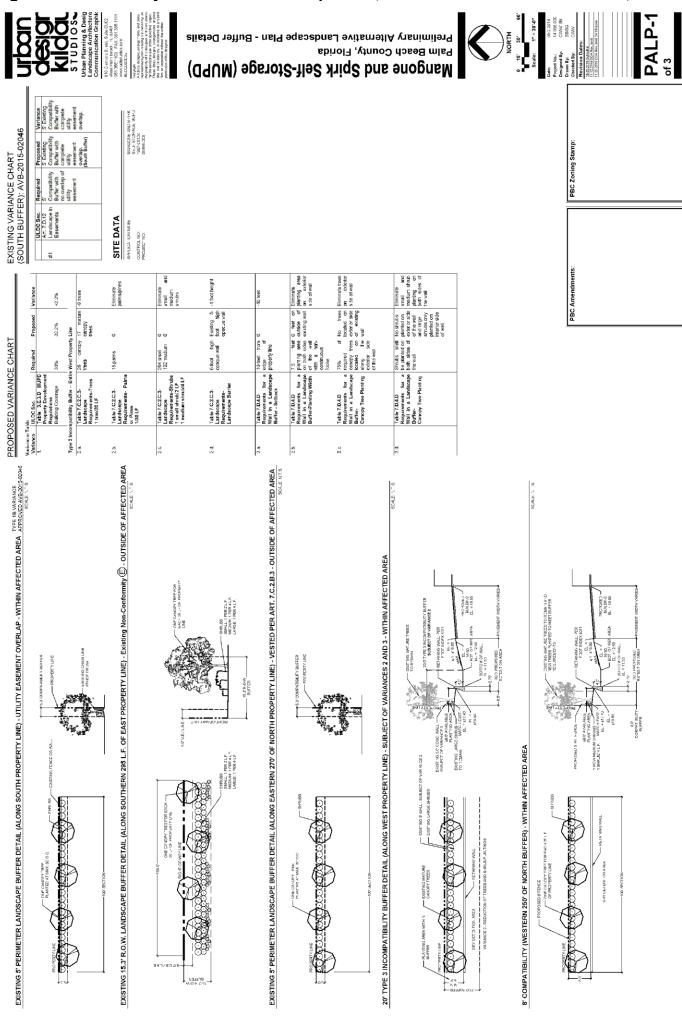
Preliminary Alternative Landscape Plan, Sheet 2 of 2 dated November 25, 2019
